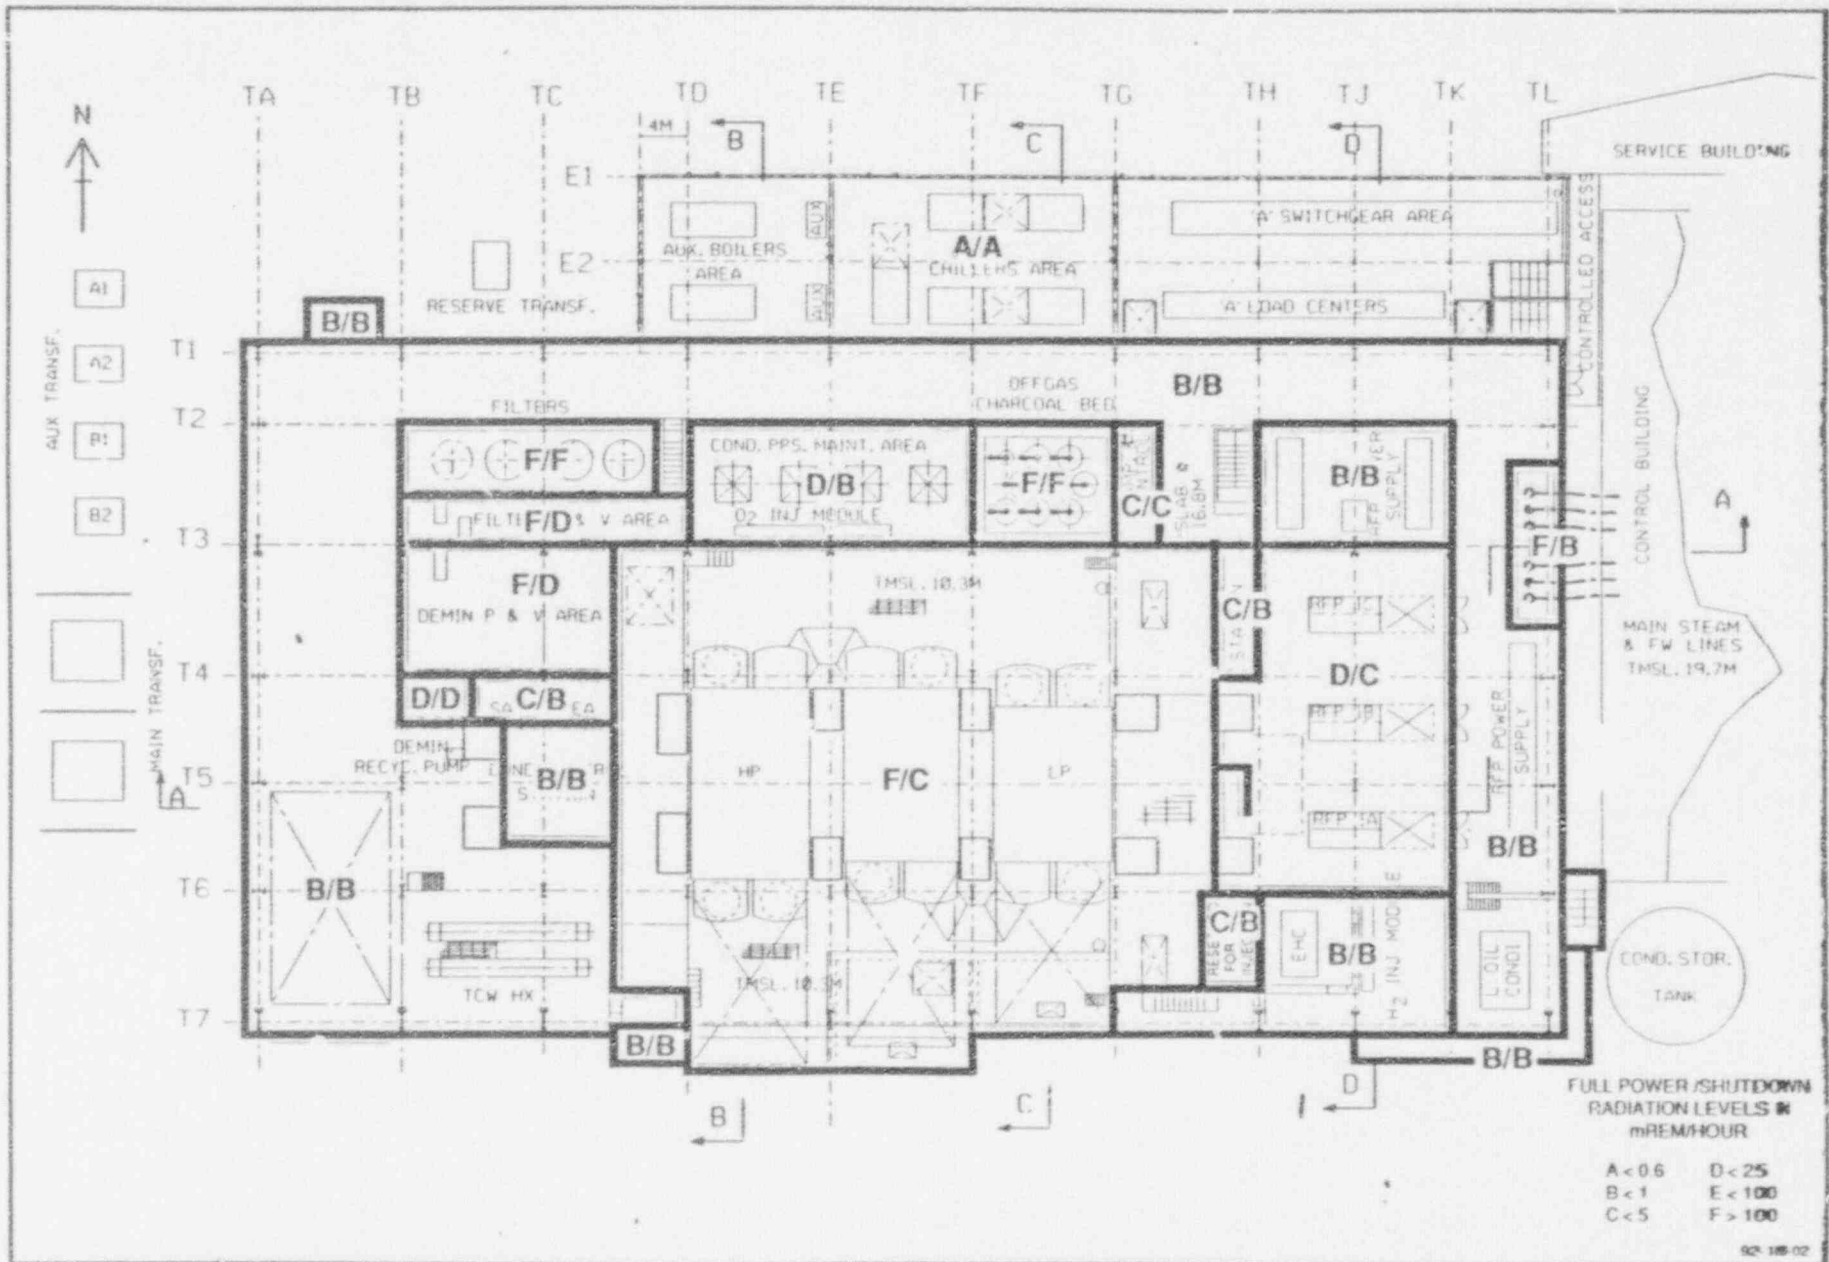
TURBINE BUILDING RADIATION ZONE AT ELEVATION TMSL 12.3M
